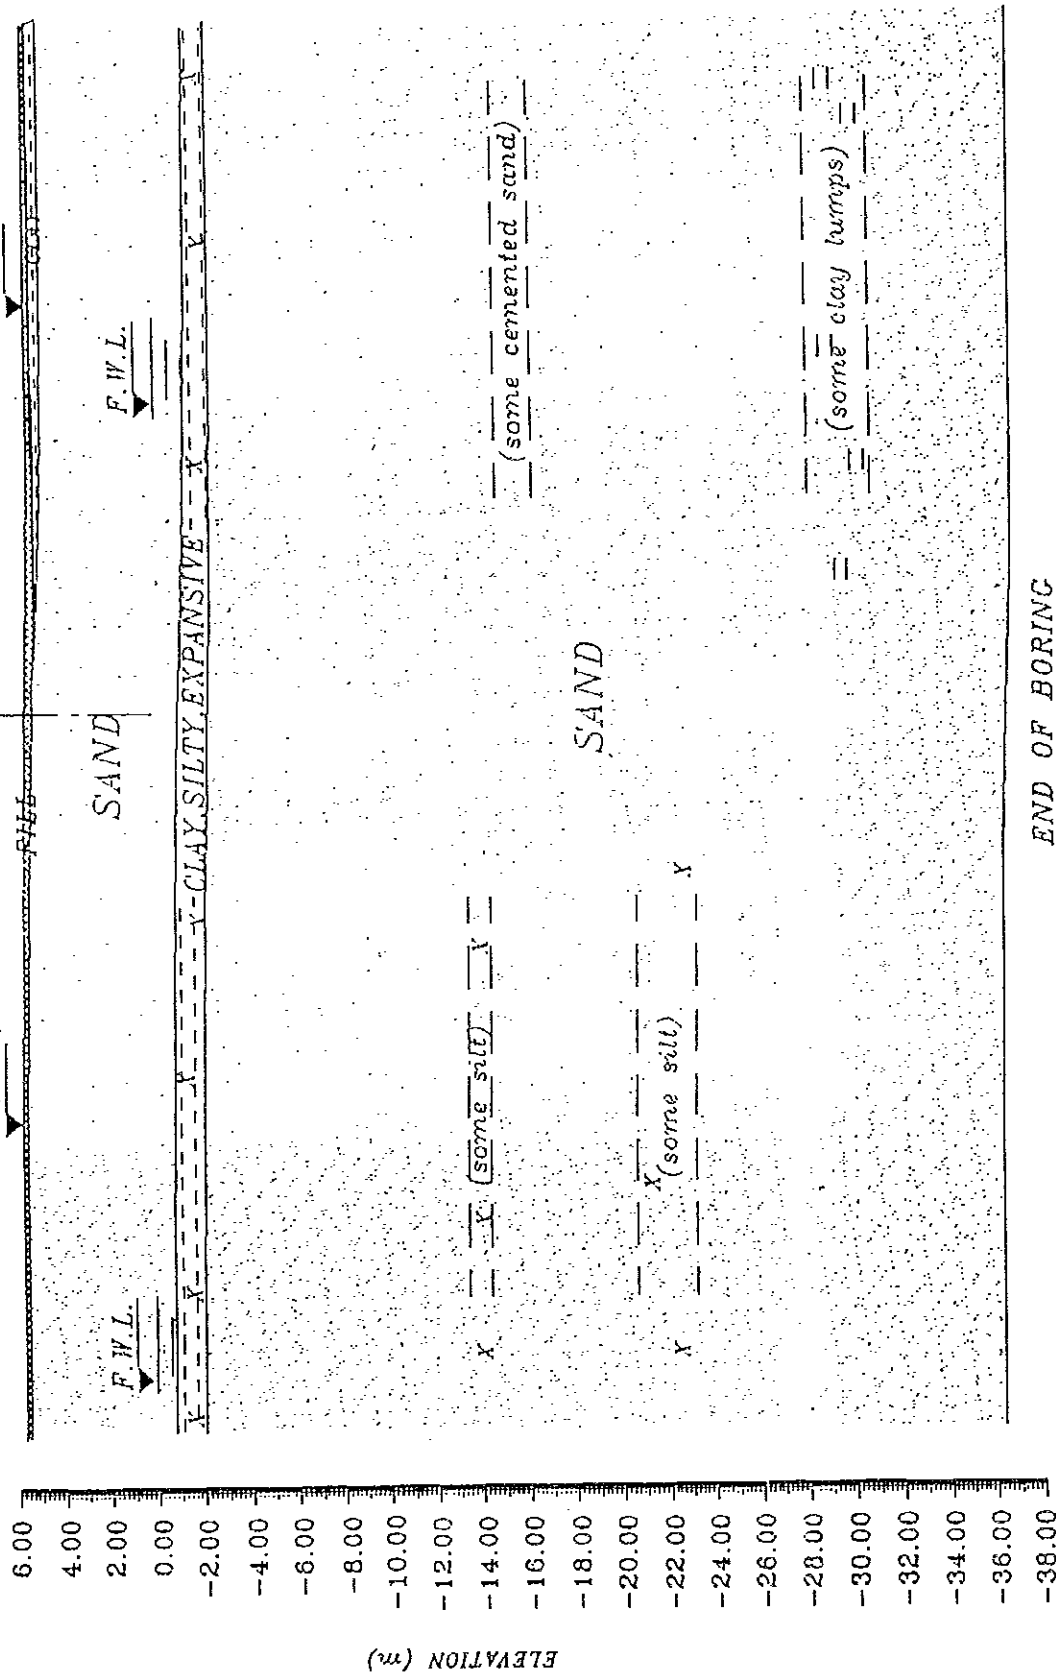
Simplified Longitudinal Geotechnical Section
